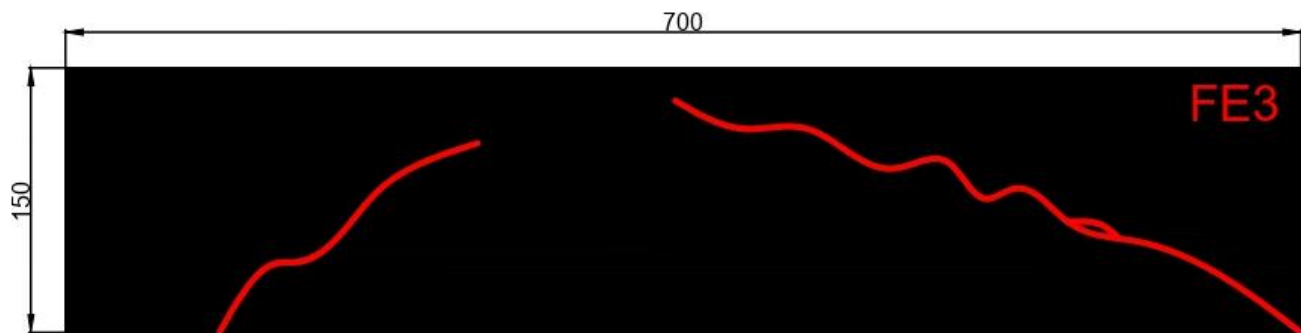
Drawing of crack pattern on longitudinal section for FE- 3
